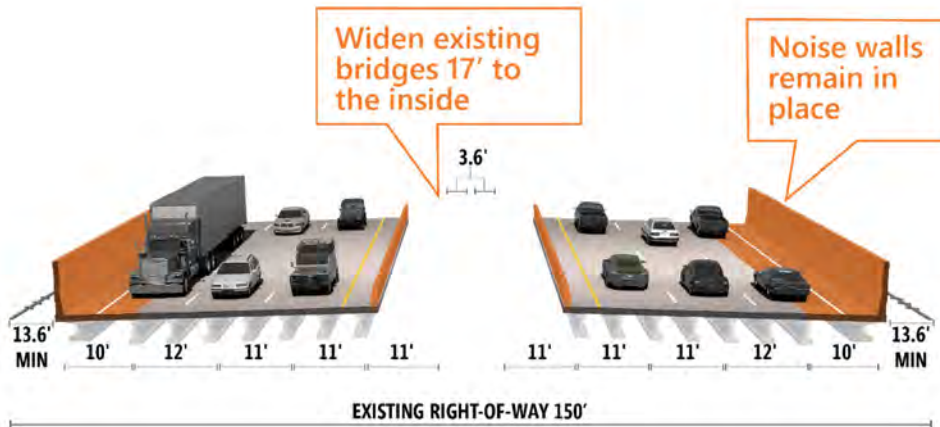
Alternative 6 – Ultimate Roadway and Bridge
